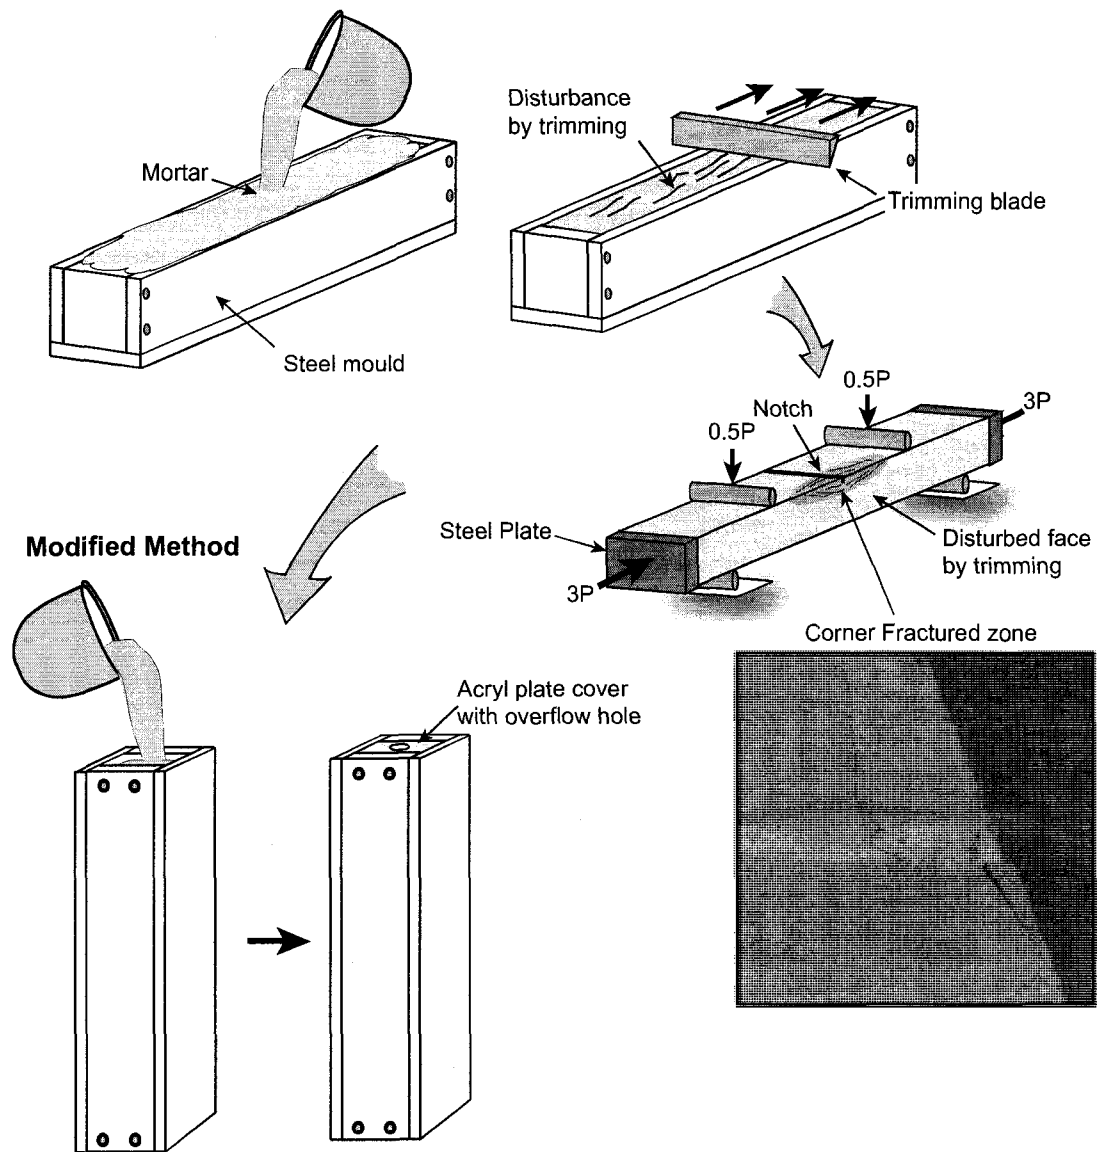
Illustration of beam specimen molding process. Note that horizontally molded specimens may generate non-uniformly distributed corner fractures.
